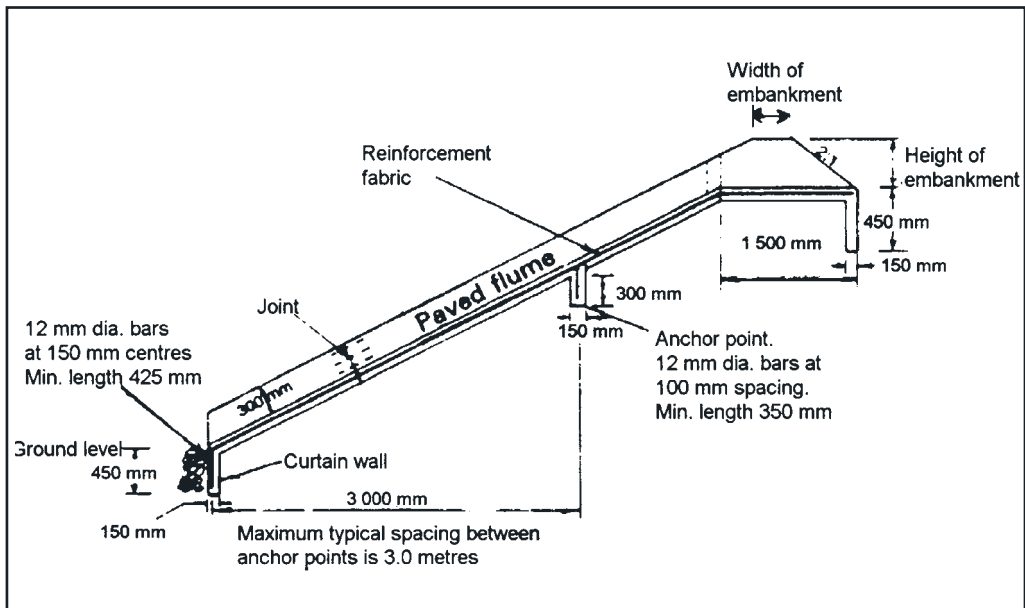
Cross-section of a typical paved chute (adapted from Virginia SWCC, 1980)
